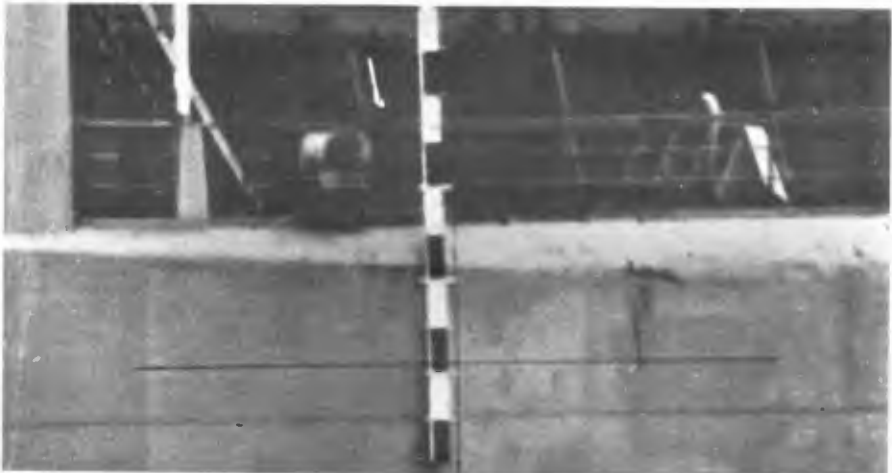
OBSERVATION PHOTO OF LEVELLING STAFF AND CROSS-HAIRS
